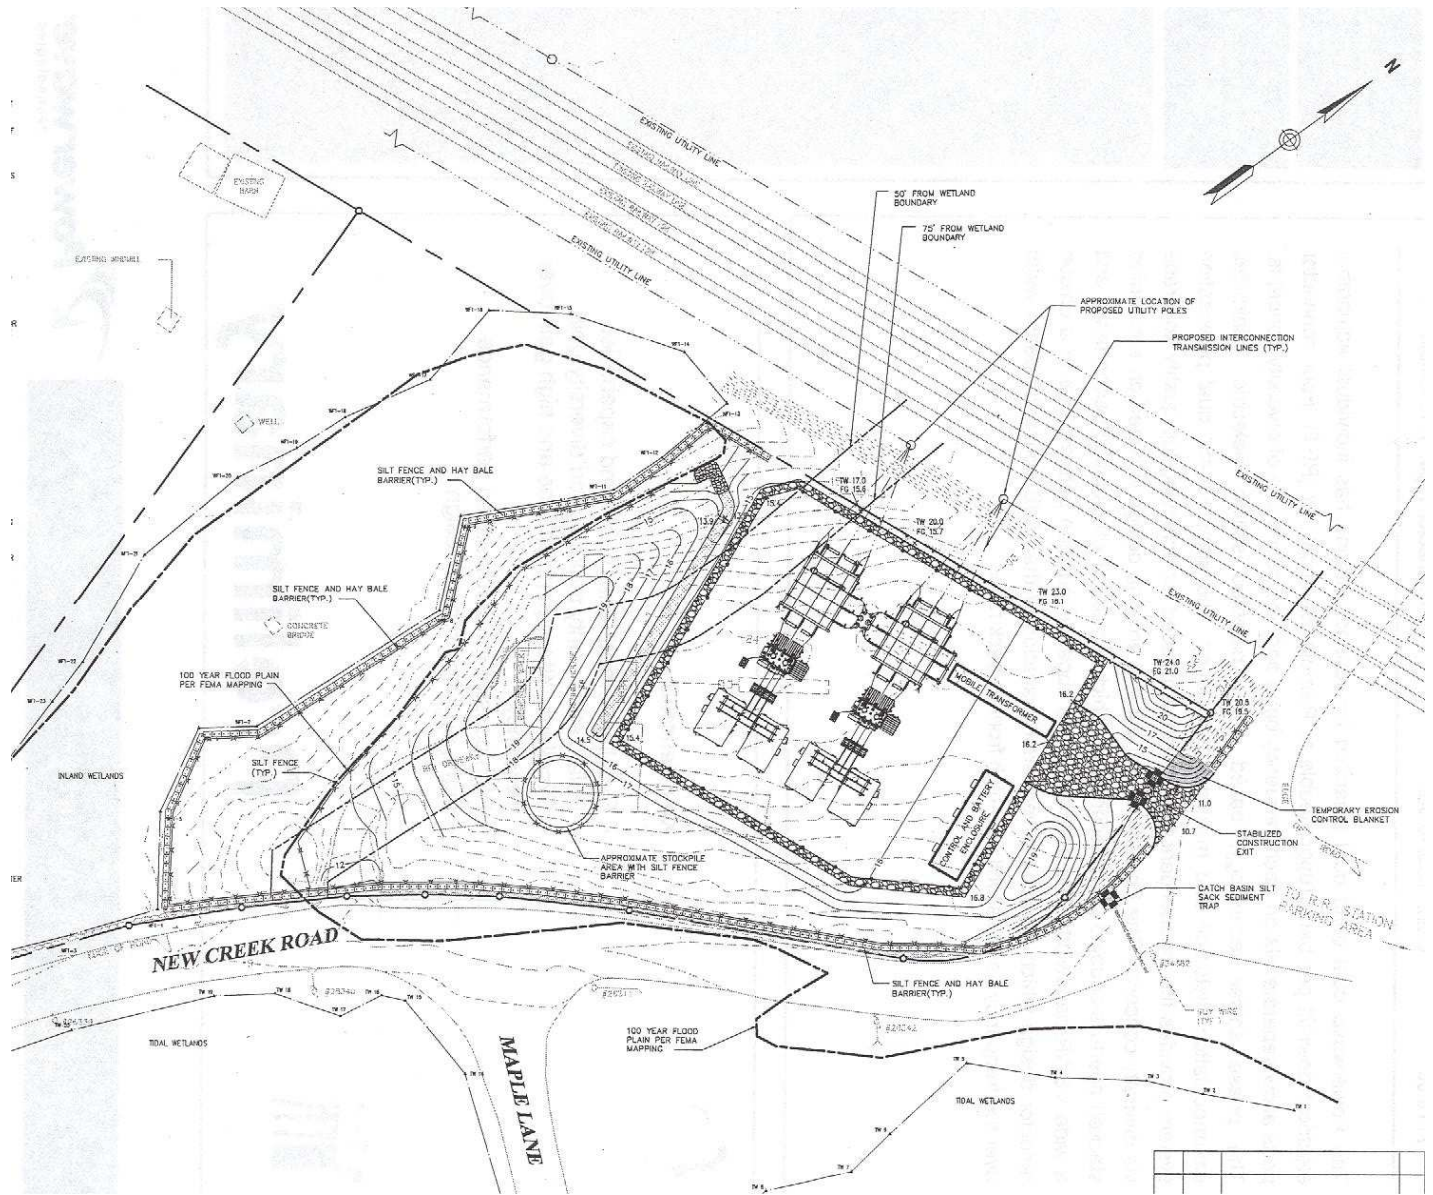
Proposed Sherwood Substation site plan. (CL&P 7)
